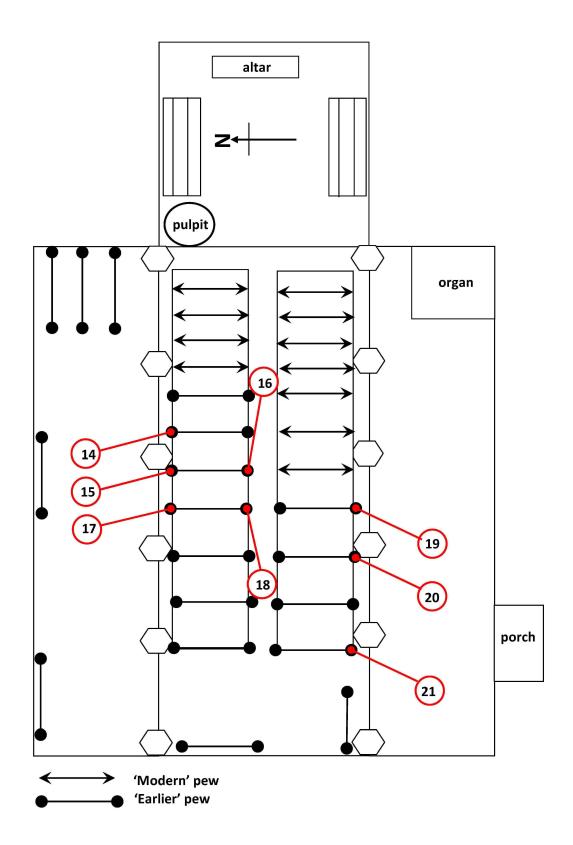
Basic plan of the nave and aisles to locate the sampled pews
